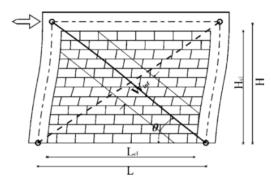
Modelling the infilled masonry wall using a compression strut (Fardis 2009)
